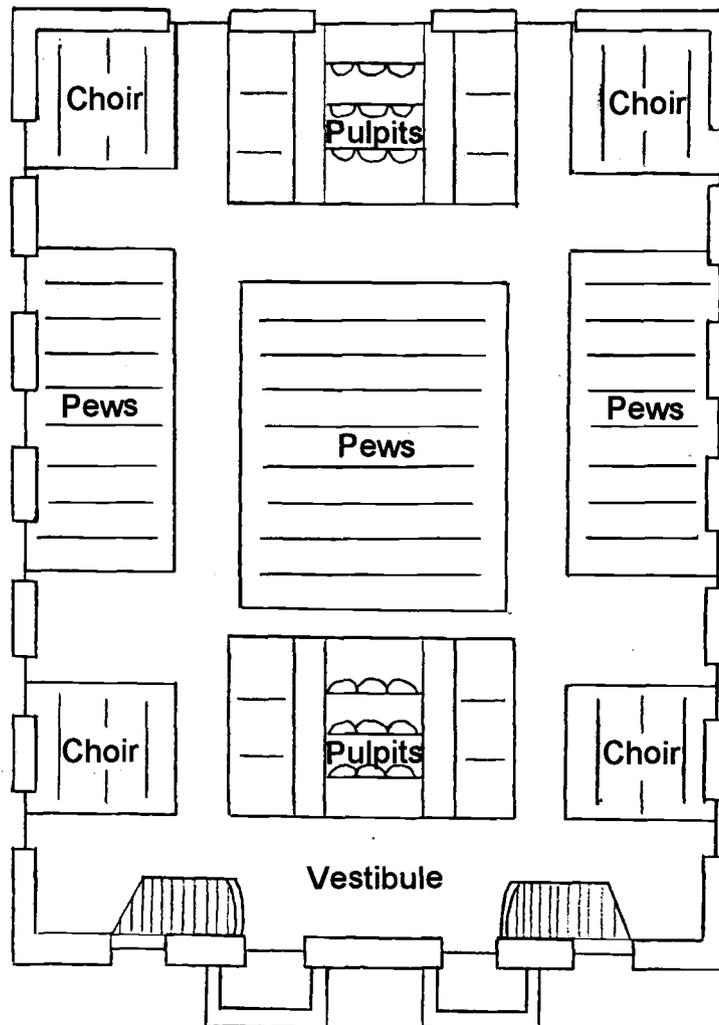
Plan view of the LDS Kirkland Temple first floor assembly hall.
